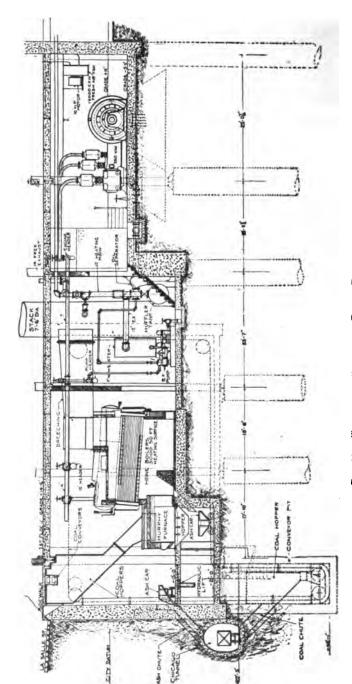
TRANSVERSE SECTION OF POWER PLANT.
